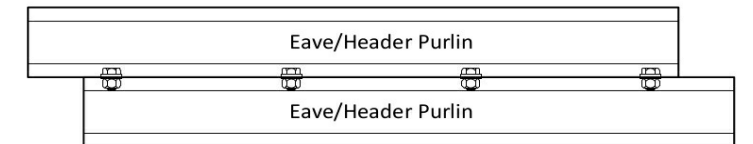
DETAIL A - END BAY EAVE/HEADER PURLIN TO SHS POST CONNECTION
